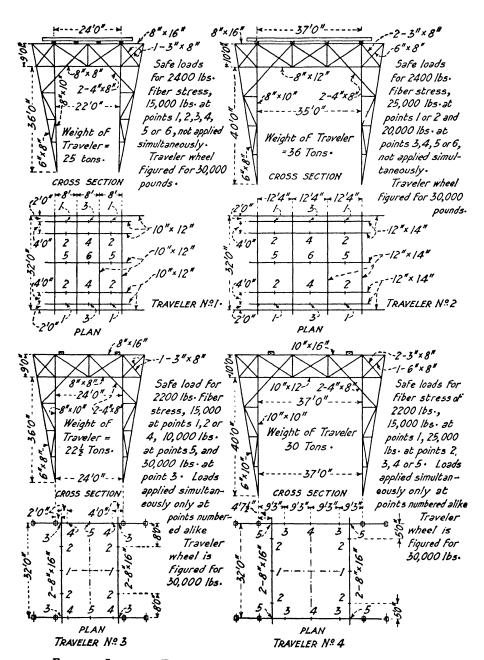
STANDARD TIMBER TRAVELERS. AMERICAN BRIDGE COMPANY.
